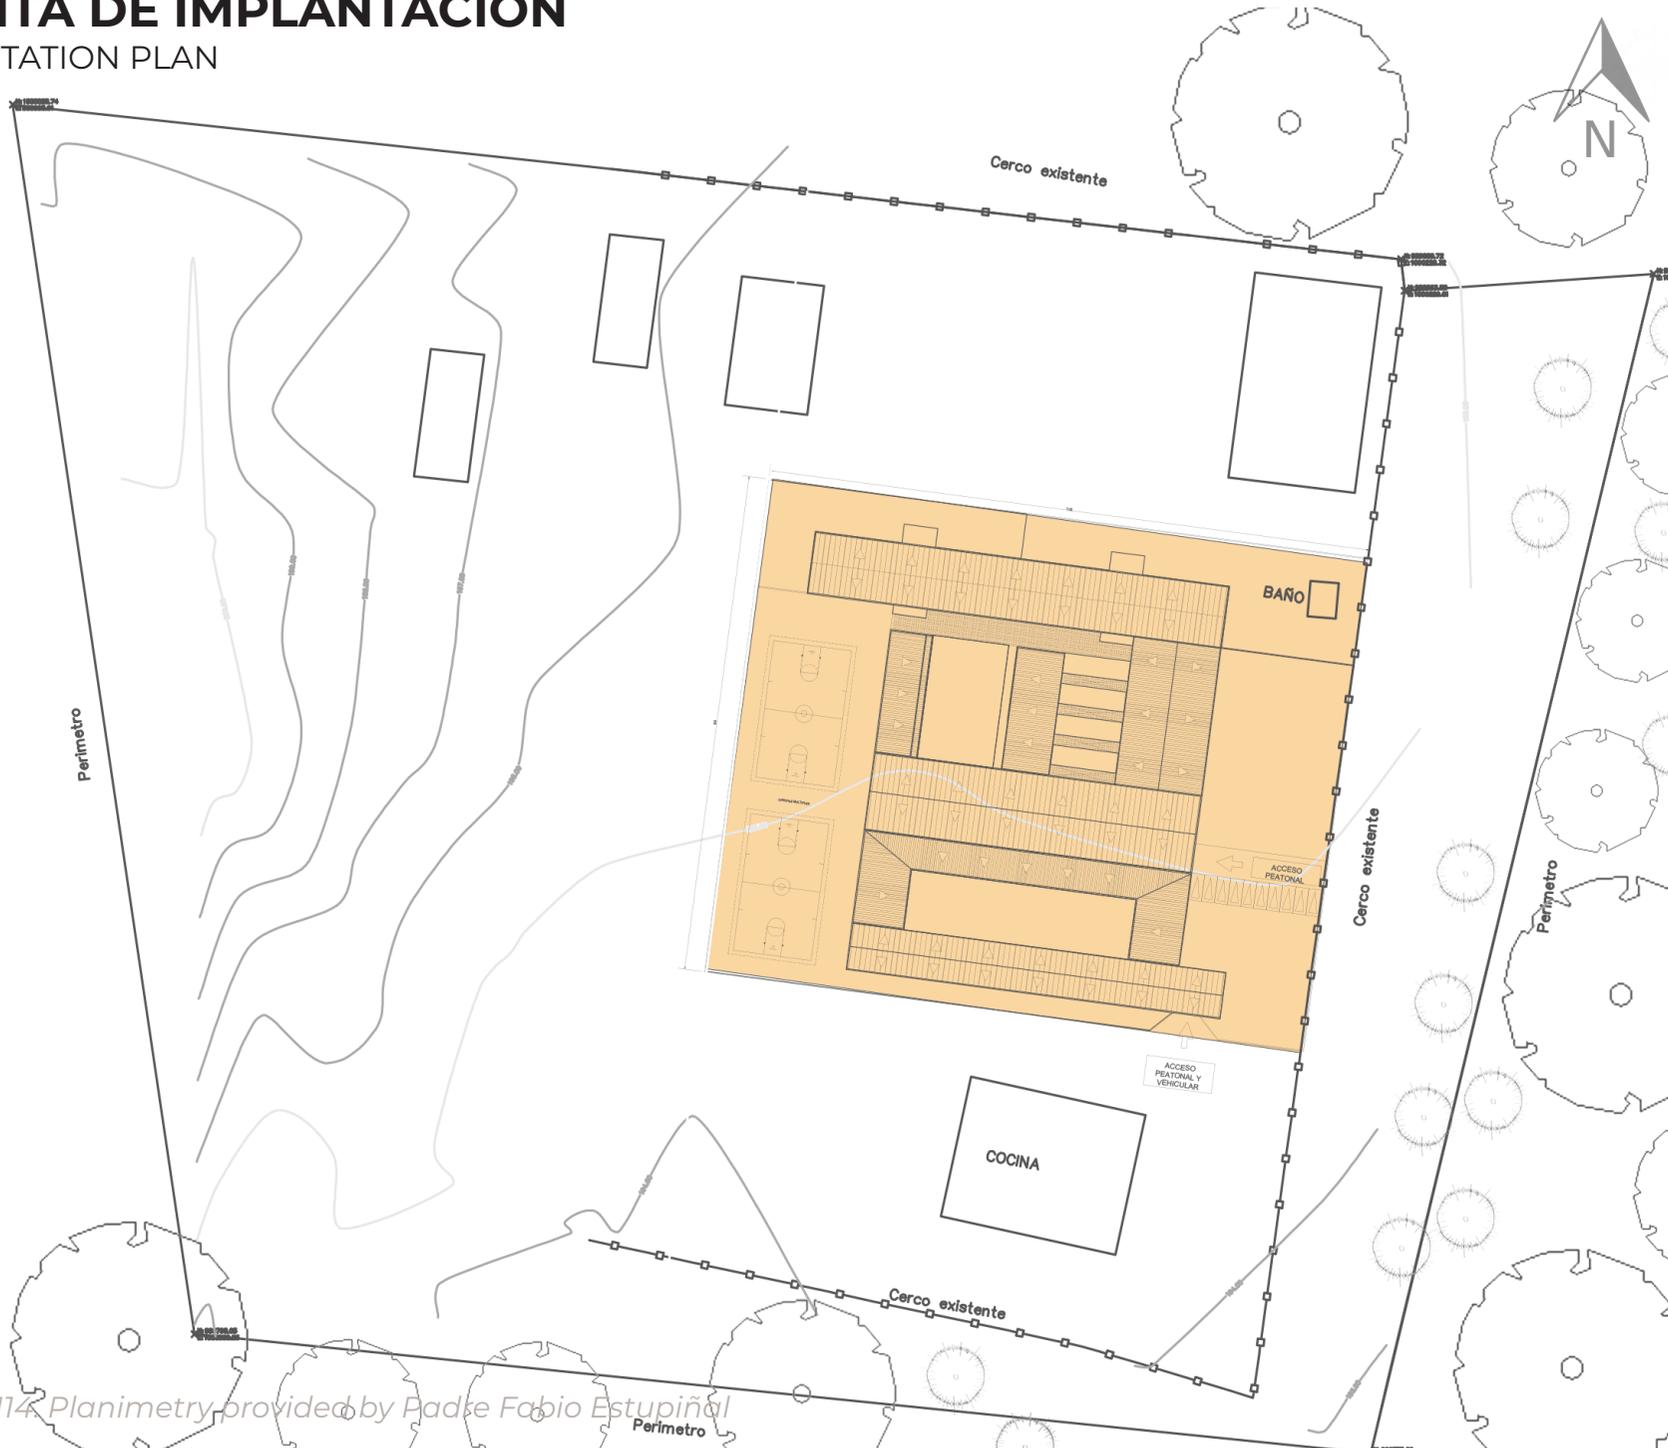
Planimetry, provided by Padre Fabio Estupiñán
